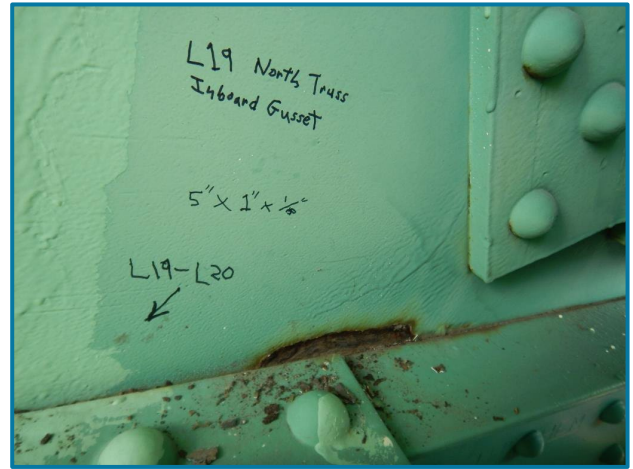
1/8” pitting with active corrosion (L19, North Truss, Span 6).
